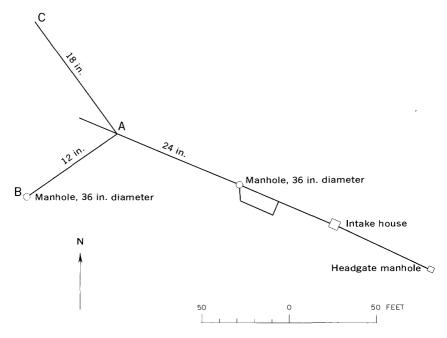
Layout of infiltration gallery, G-1, northwest of Towacc.
